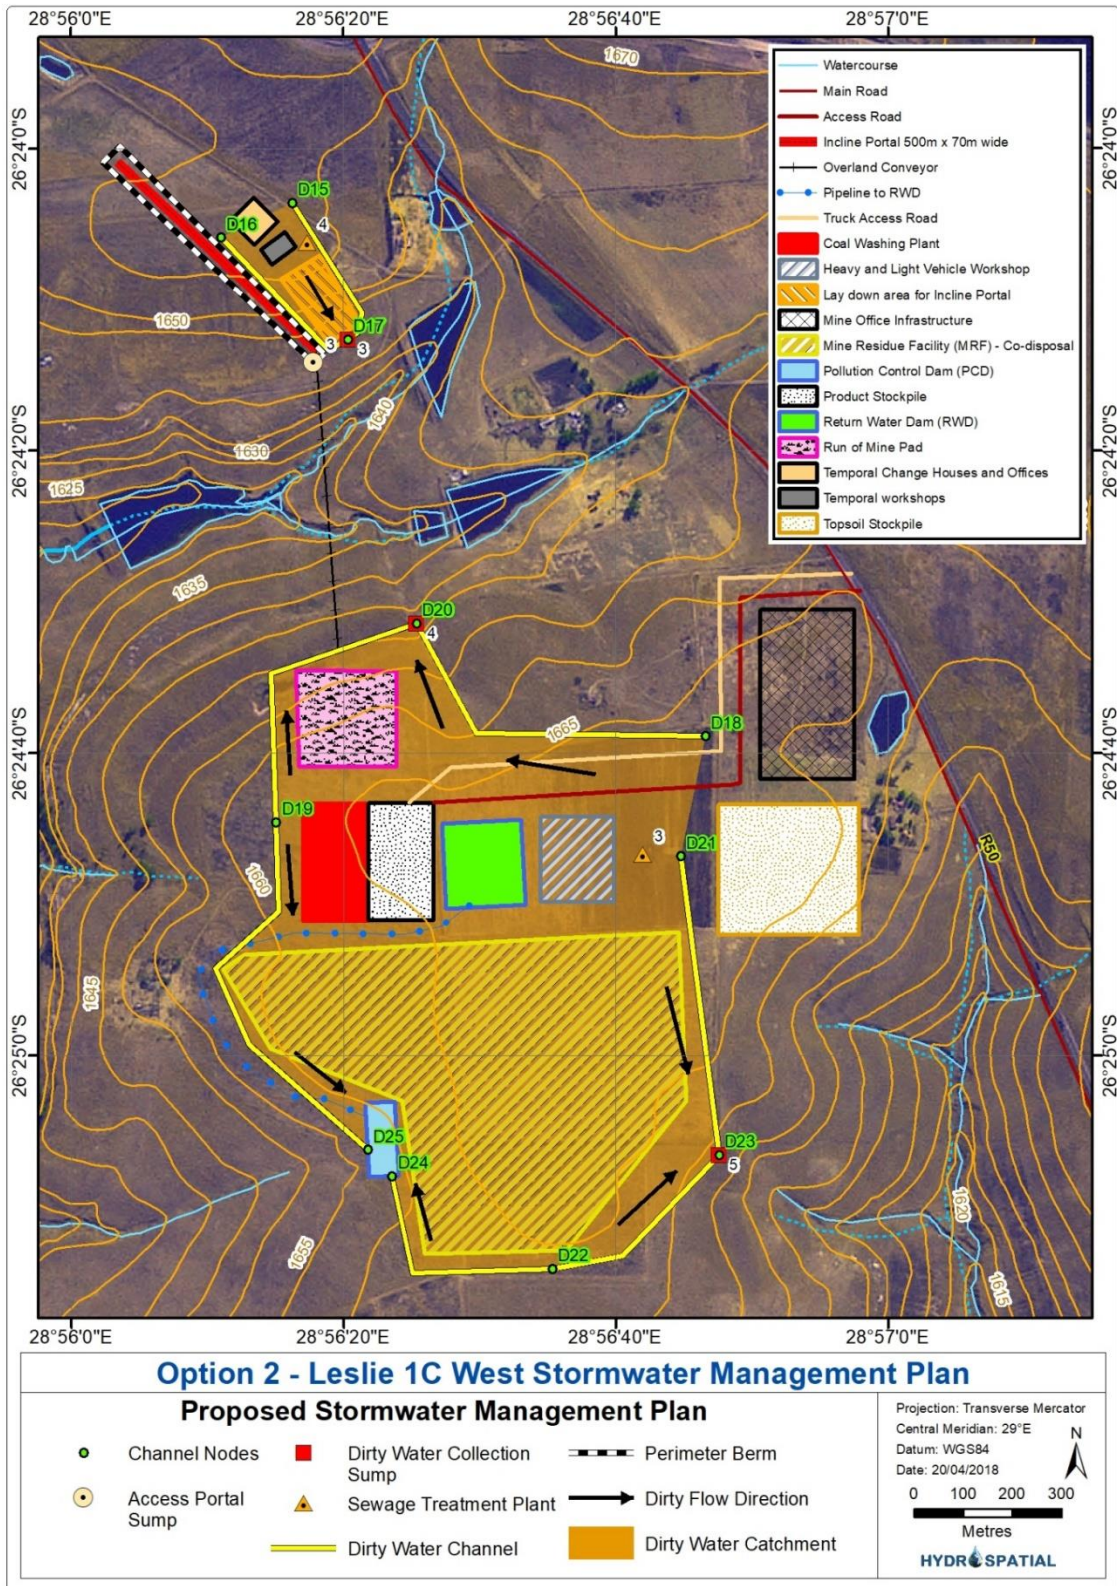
Proposed stormwater management plan for Leslie 1C West
